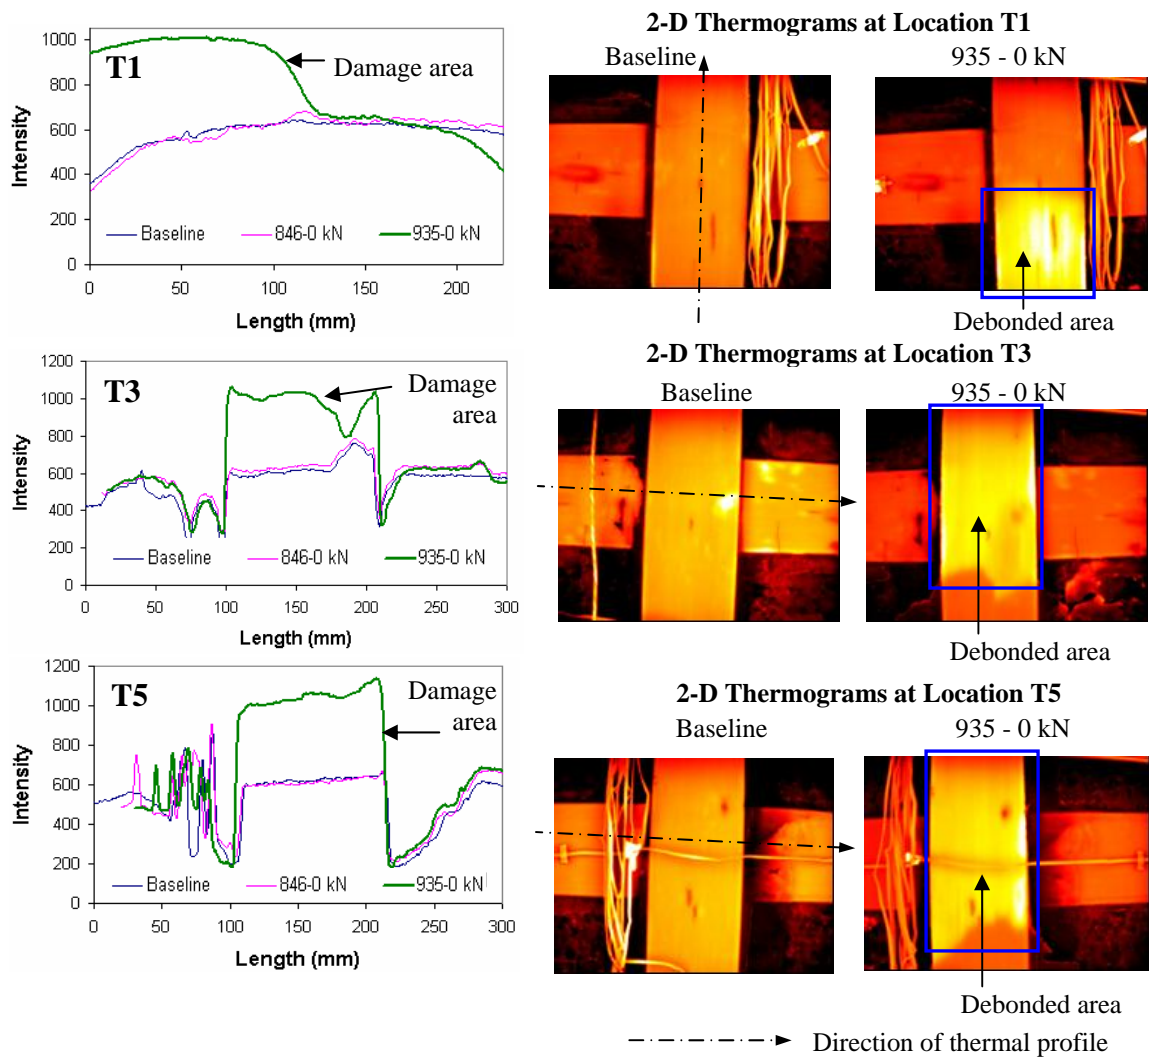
Damage at transverse strip - longitudinal strip overlap area (Defect type 3)
